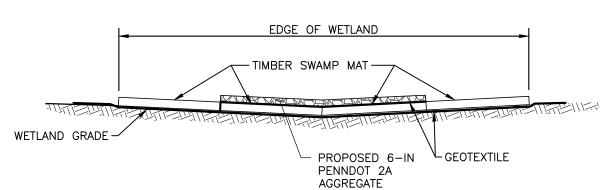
TEMPORARY EQUIPMENT CROSSING OF WETLAND - TIMBER SWAMP MAT
